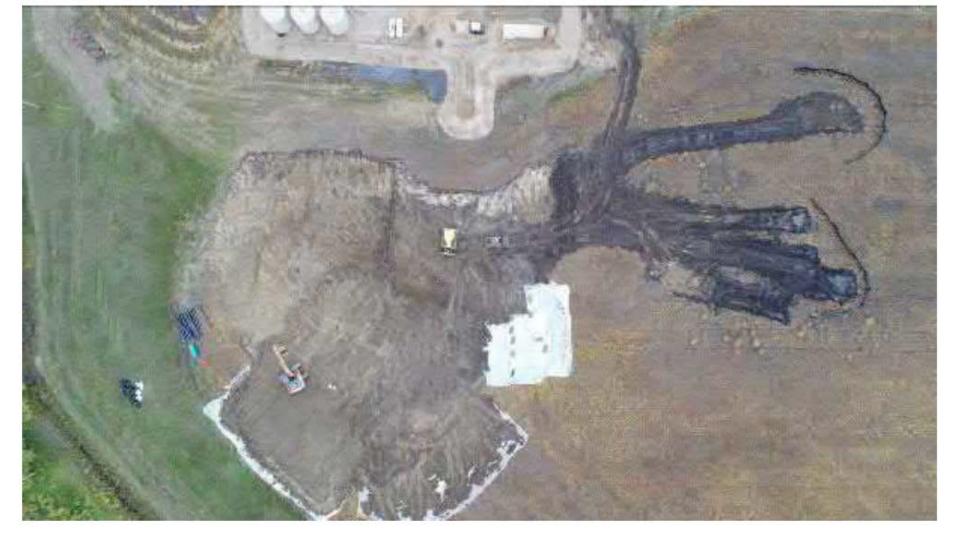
Stockpiling topsoil and excavated contaminated soil.
